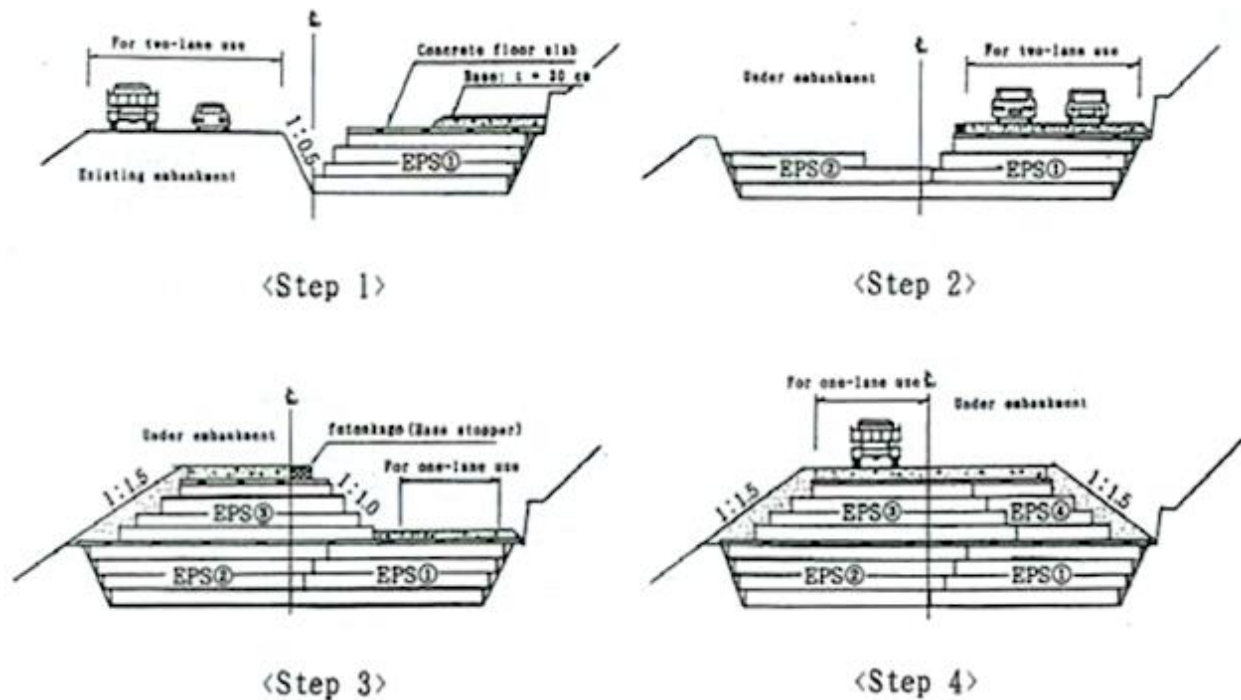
Cross-section view of potential method for phased construction of EPS-block Geofoam roadway embankment fills (Tsukamoto 1996).
